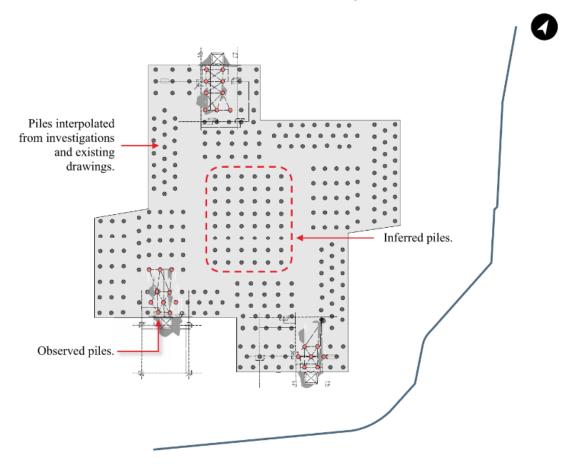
Plan showing anticipated existing foundations of Euston Tower
